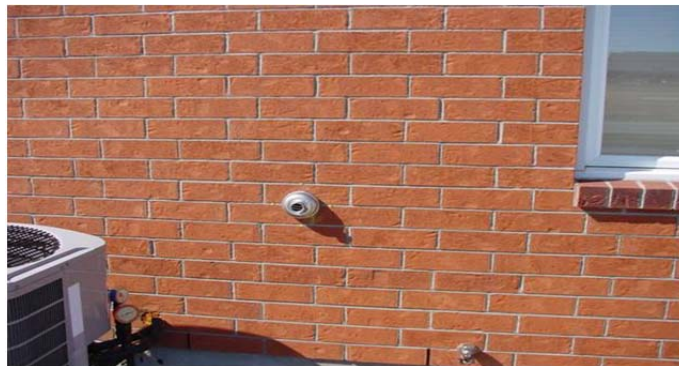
Photograph of Concentric Vent Kit Connected to First Floor Family Room Showing Exterior Termination
